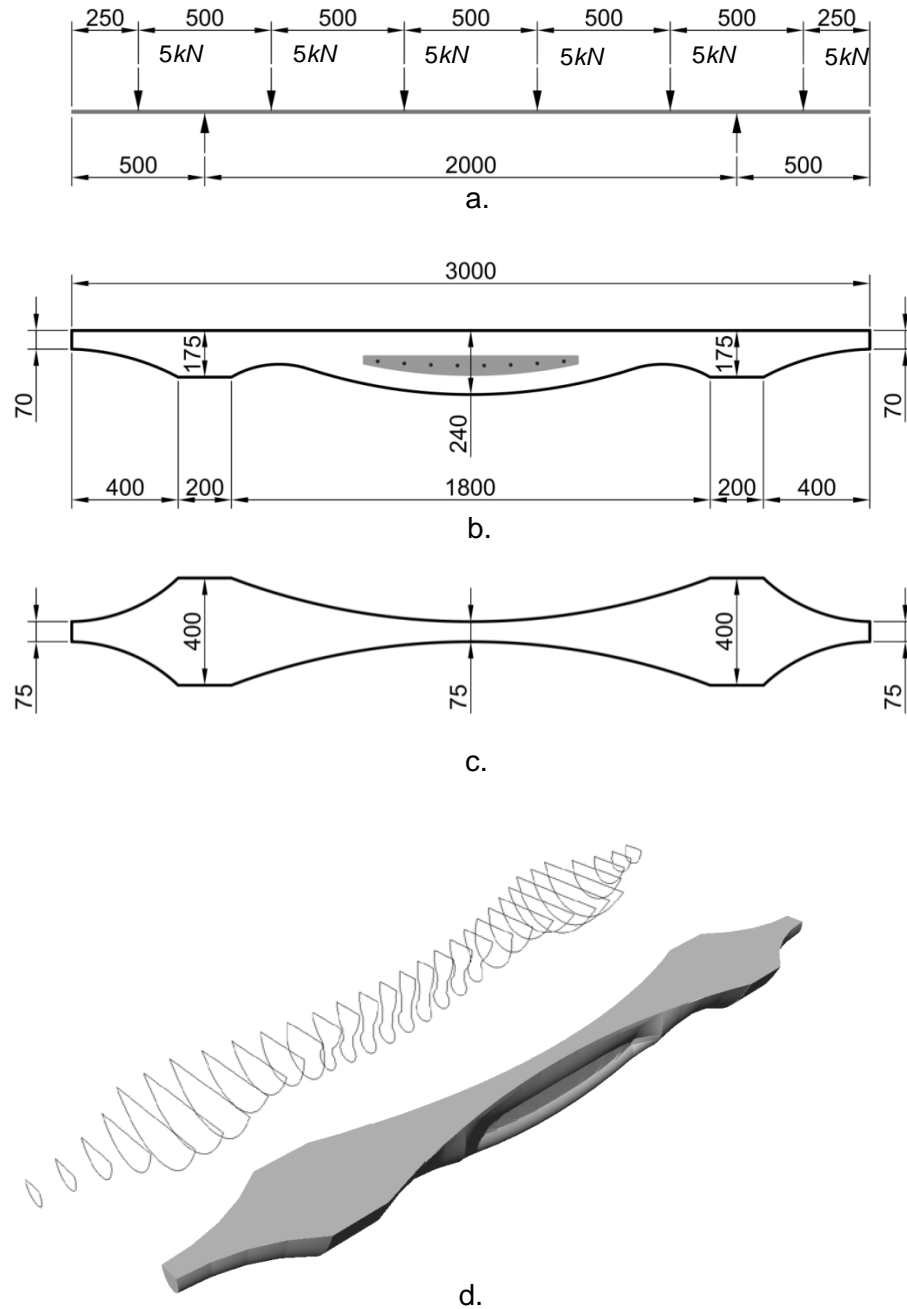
Beam FFB 3 geometry details: (a) loading arrangement, (b) elevation, (c) plan and (d) perspective view (all dimensions are in mm)
